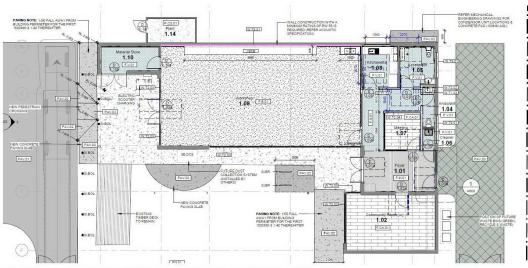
Proposed floorplan for Men's Shed (North is located to the right)
